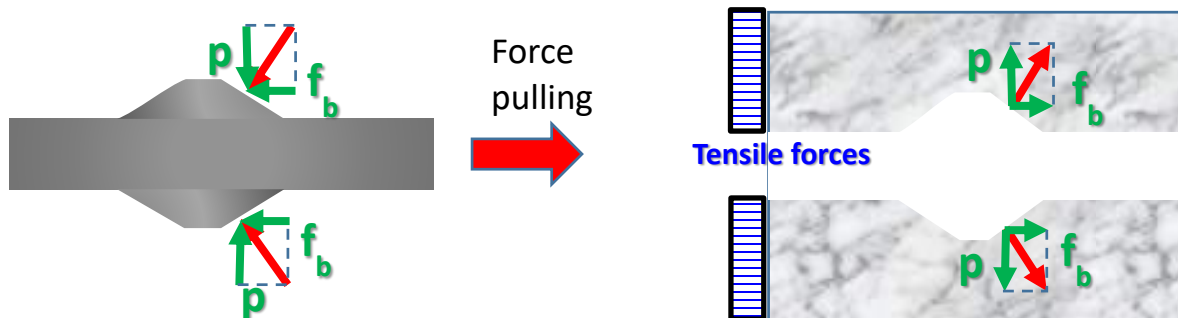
Exaggerated detail: (a) Forces exerted by concrete on the bar. (b) Forces exerted by the bar on the concrete cover.
